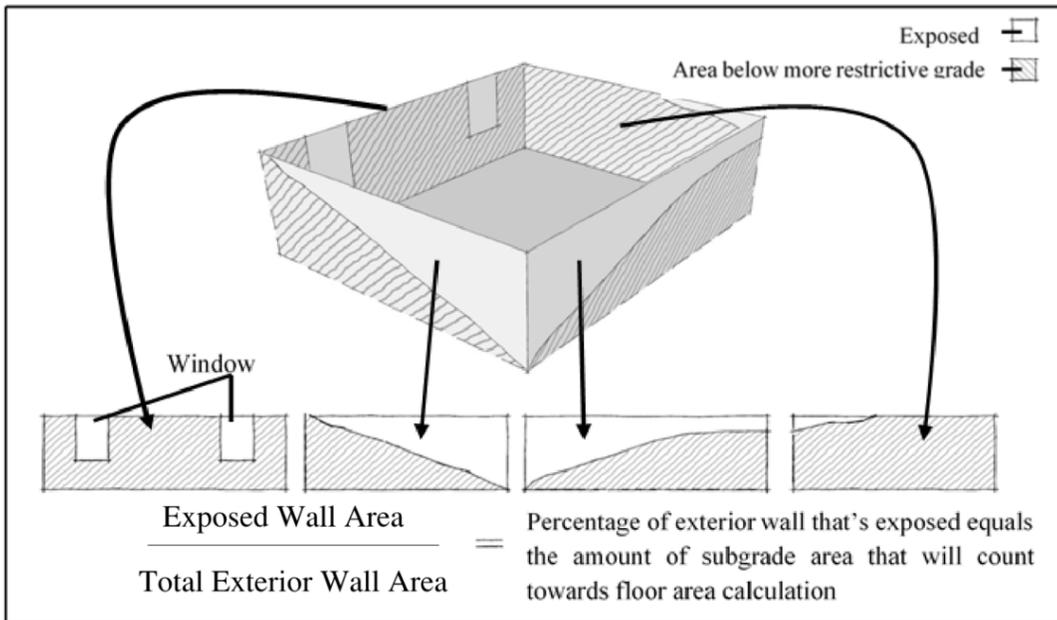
Determining the amount of a subgrade floor to be counted as Floor Area
